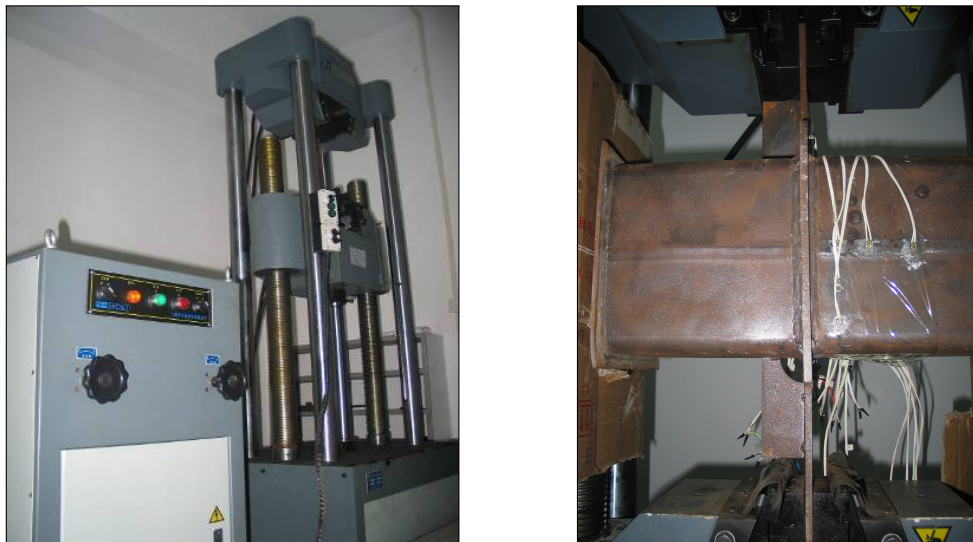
Experimental set-up: axial tensile testing machine (left) and tensile loading (right).
